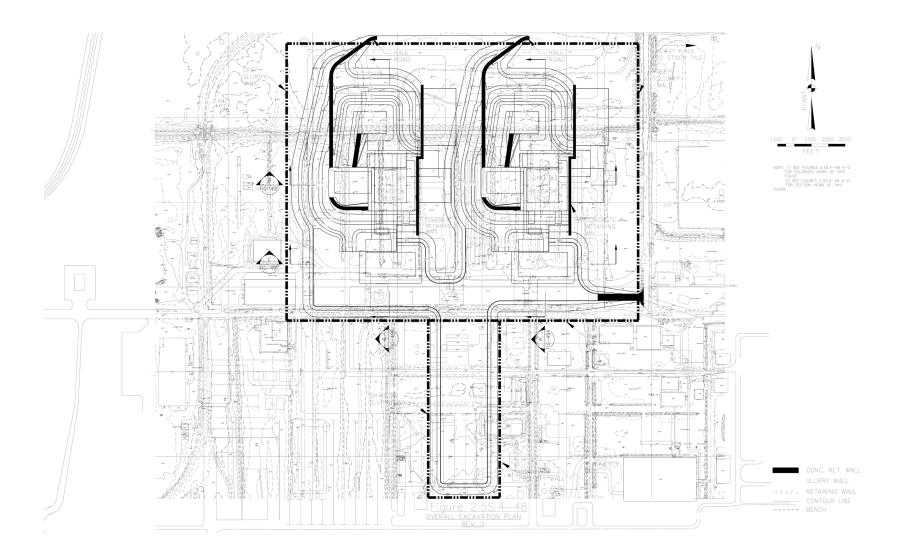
S.4-48 Overall Excavation Plan Rev. D
